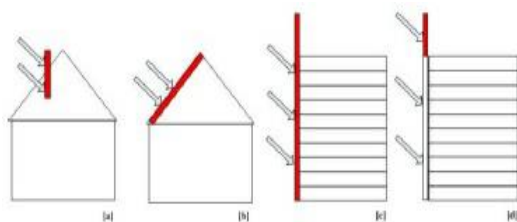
Models of connecting the solar chimney to the building envelope [5].
